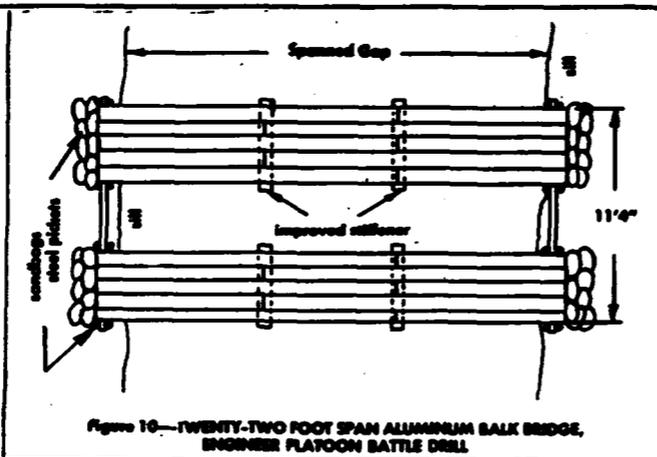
TWENTY-TWO FOOT SPAN ALUMINUM BALK BRIDGE, ENGINEER PLATOON BATTLE DRILL.
